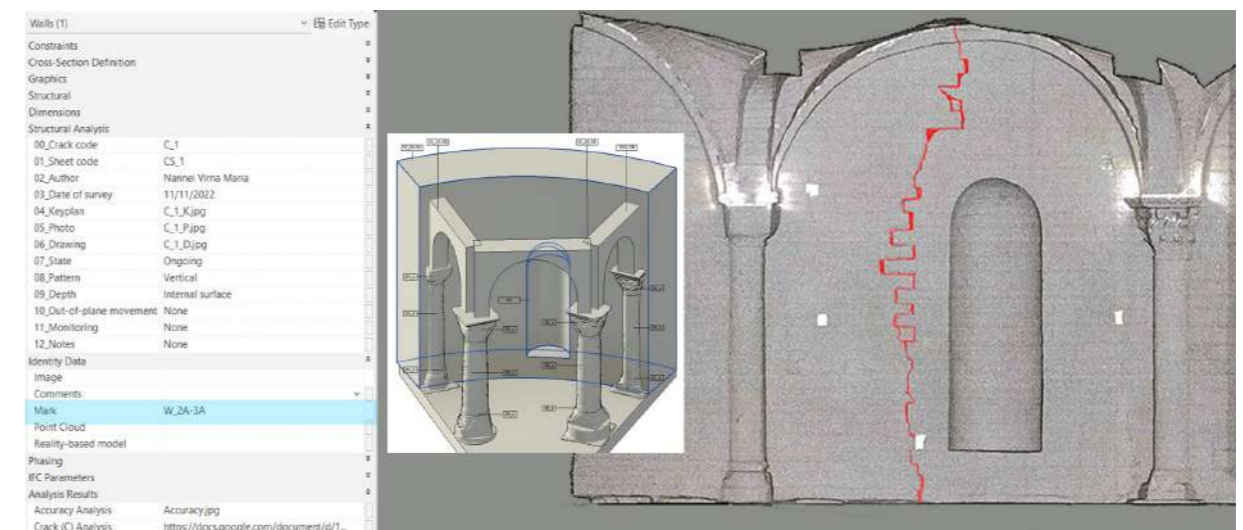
Crack analysis of section 2 walls. (@V.M. Nannei).
